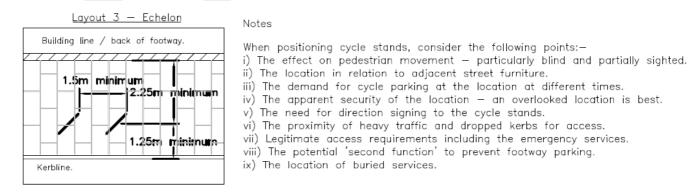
Southampton City Council Standard detail drawings for short stay cycle parking layouts
